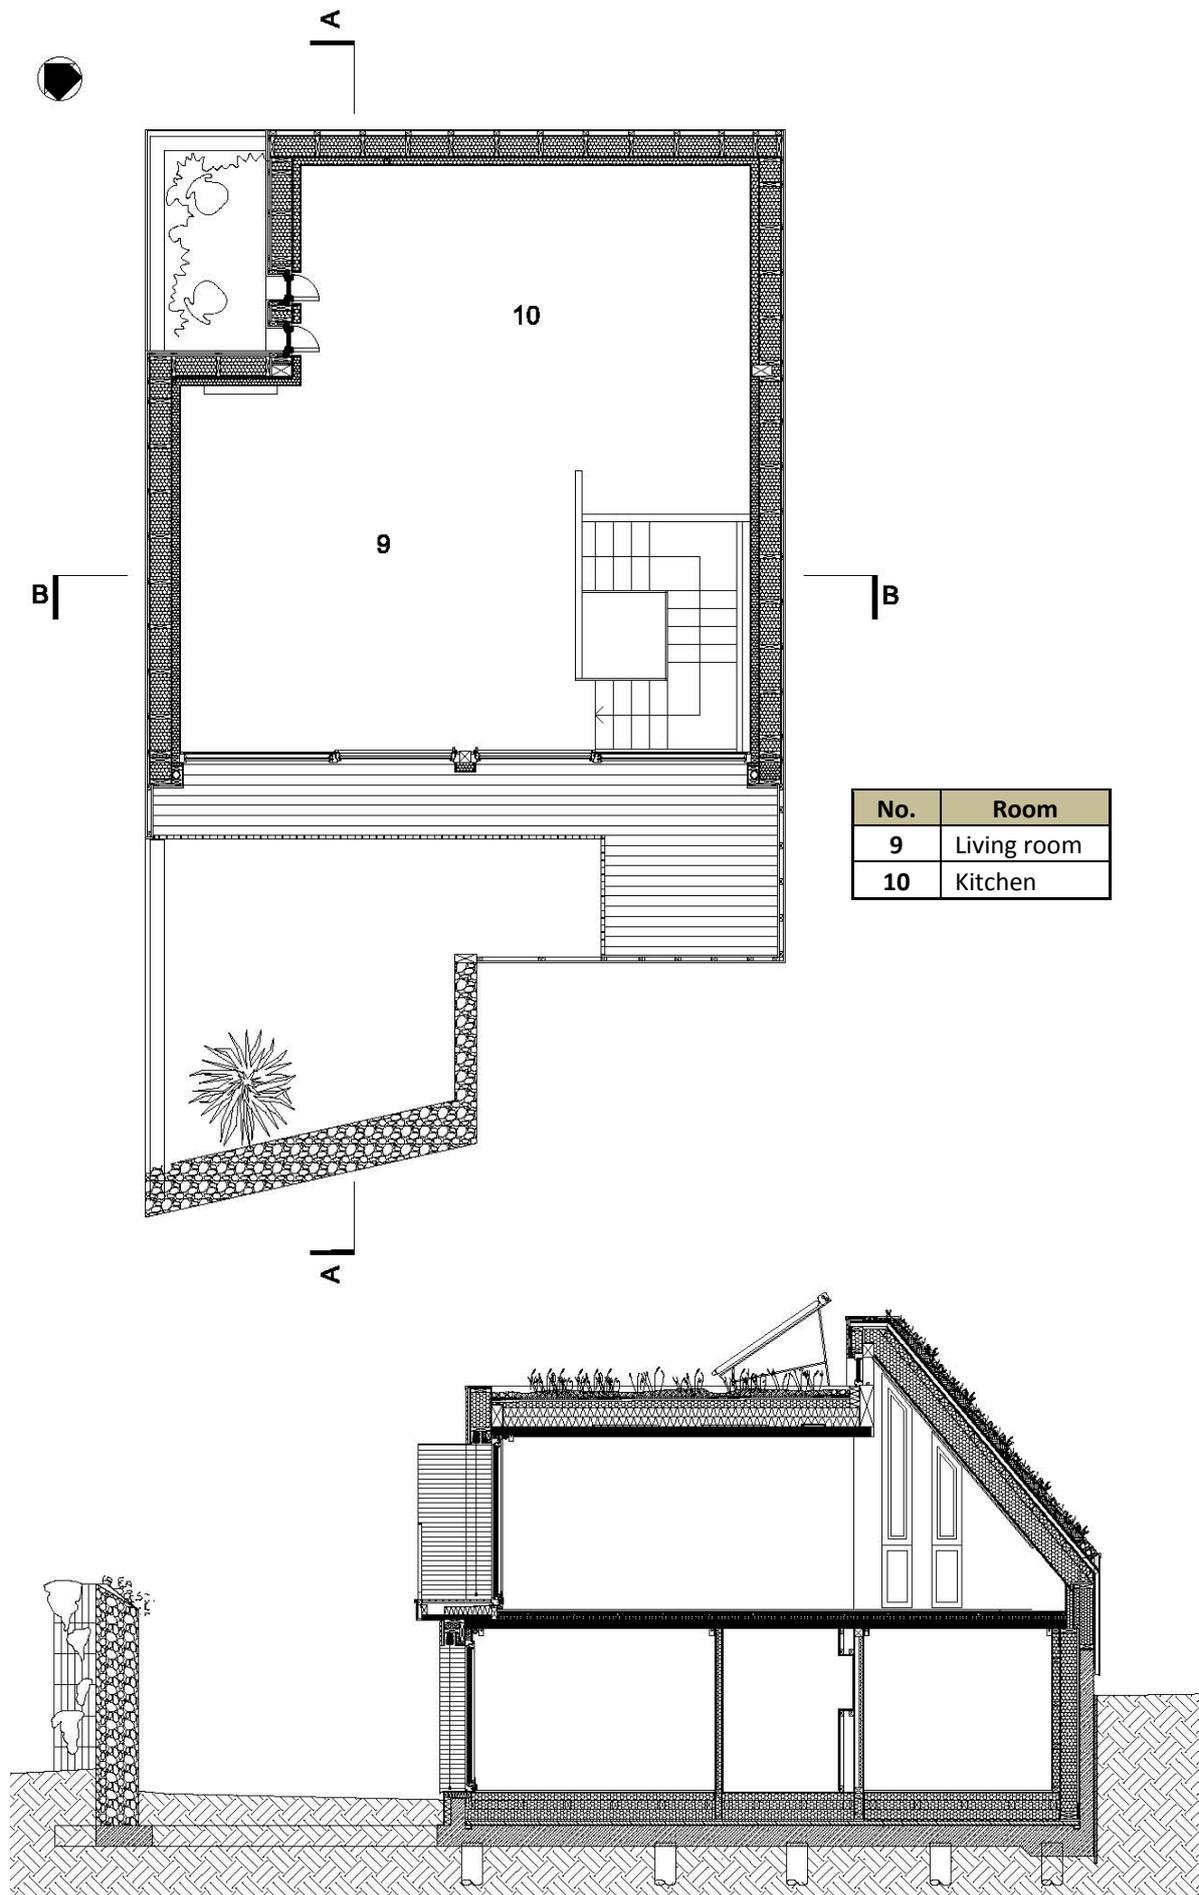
First floor and cross-section A-A, S=1:100 (Bere: architects, 2009)
